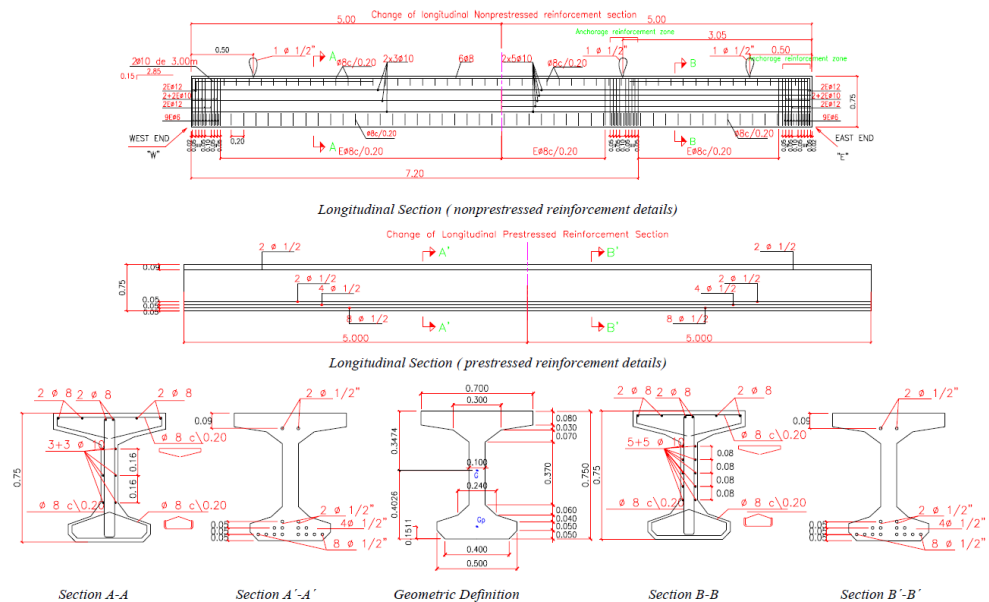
Case PB6. Geometry, reinforcement layout and location of prestressing strands (dimensions in m). The pictures are taken from (Choulli, 2005).
